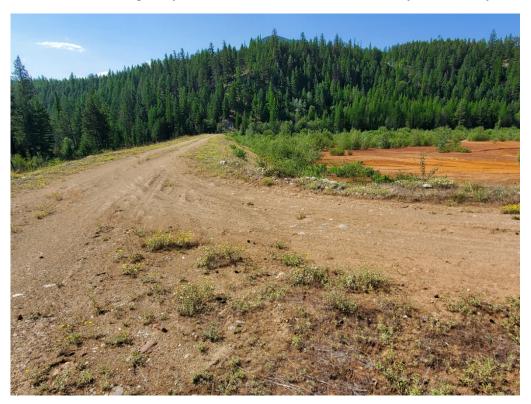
Sludge Impoundment South Dike Downstream Slope
